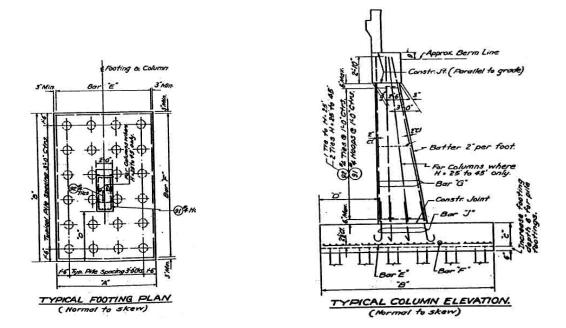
Bridge 5/227 Abutment Sub-Ground Column and Footing
